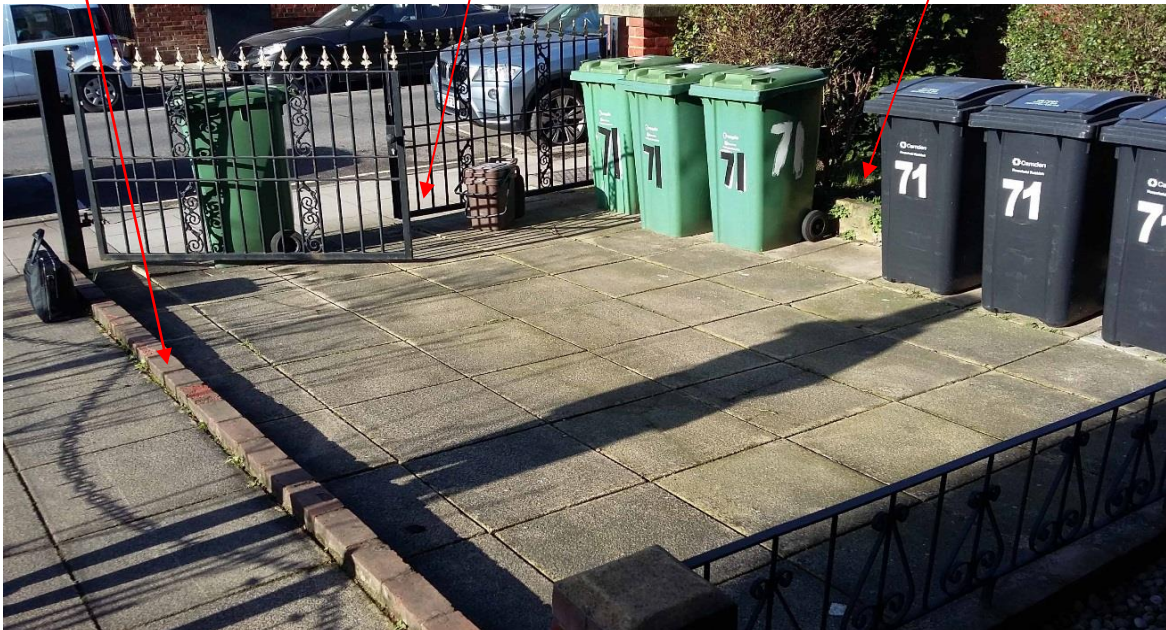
The parking area and path leading to the front door of No.71 slope slope towards the Goldhurst Terrace footway.
